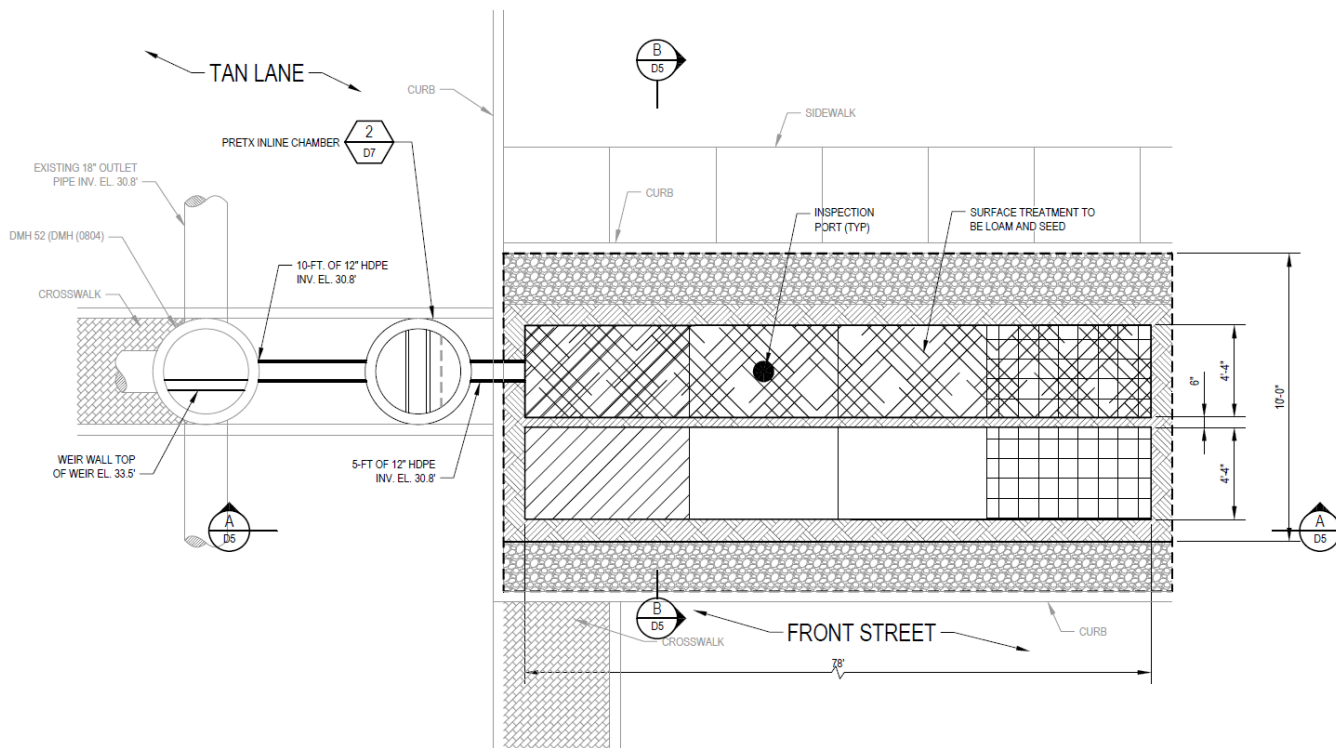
Engineering Plan View Detail for Front Street Subsurface Infiltration BMP 5
